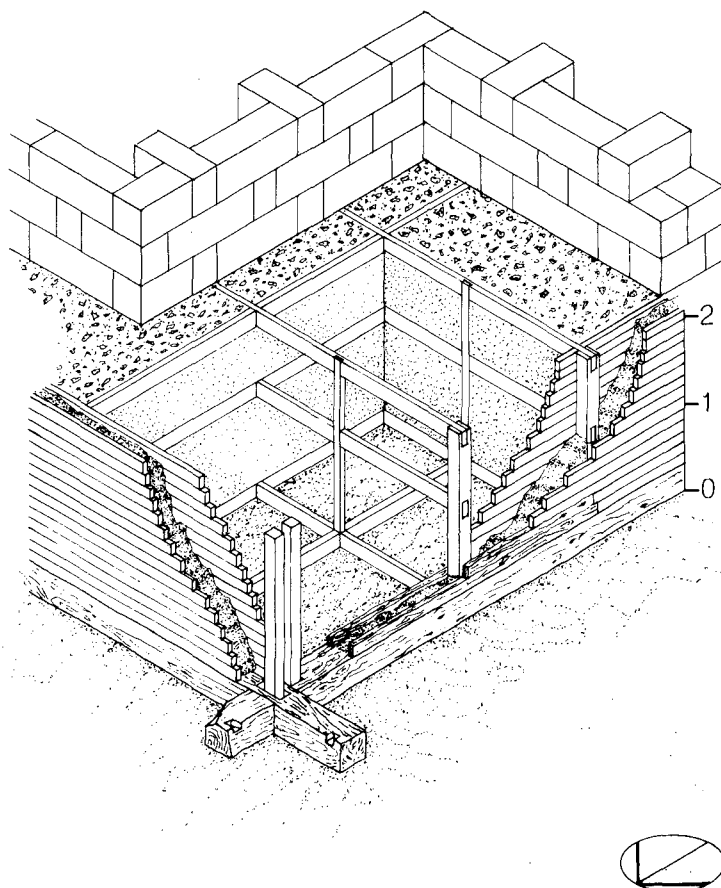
Caesarea: reconstruction of formwork in area G. Drawing: R. L. Vann.
